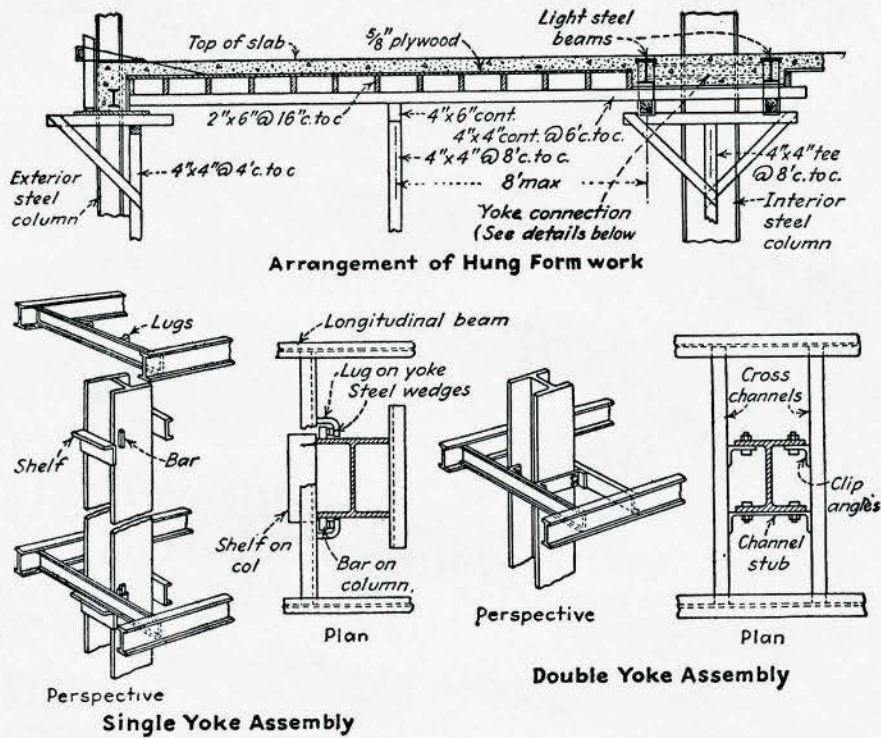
Structural system involving steel columns and concrete slabs is made more efficient by light steel beams that serve initially as supports for floor forms and then as reinforcing for the concrete beams.
